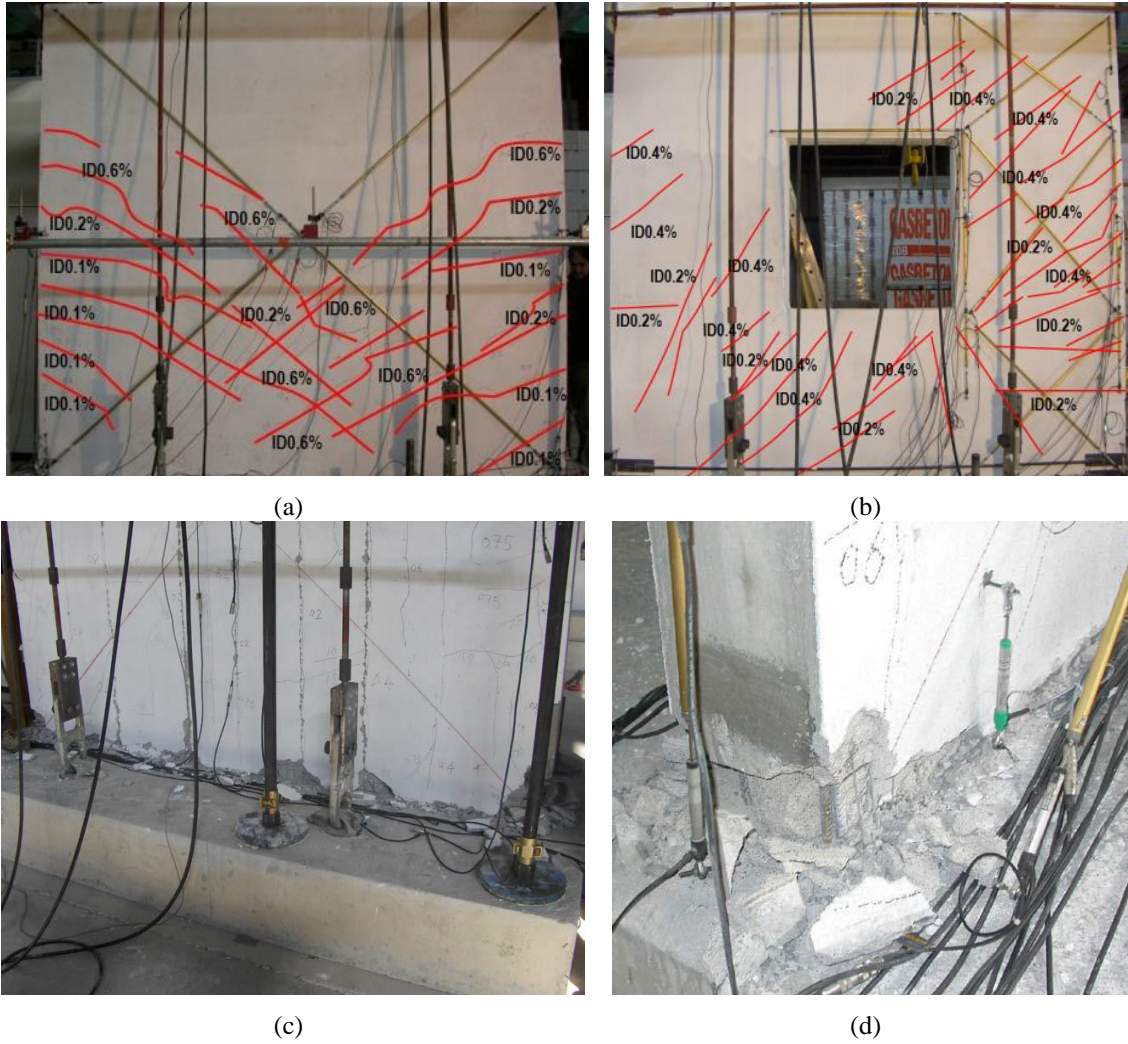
Cracking patterns at the end of the test: (a) specimen PW1; (b) specimen PW4; (c) concrete spalling at the base, for specimen PW3; (d) concrete corner crushing for specimen PW2.
